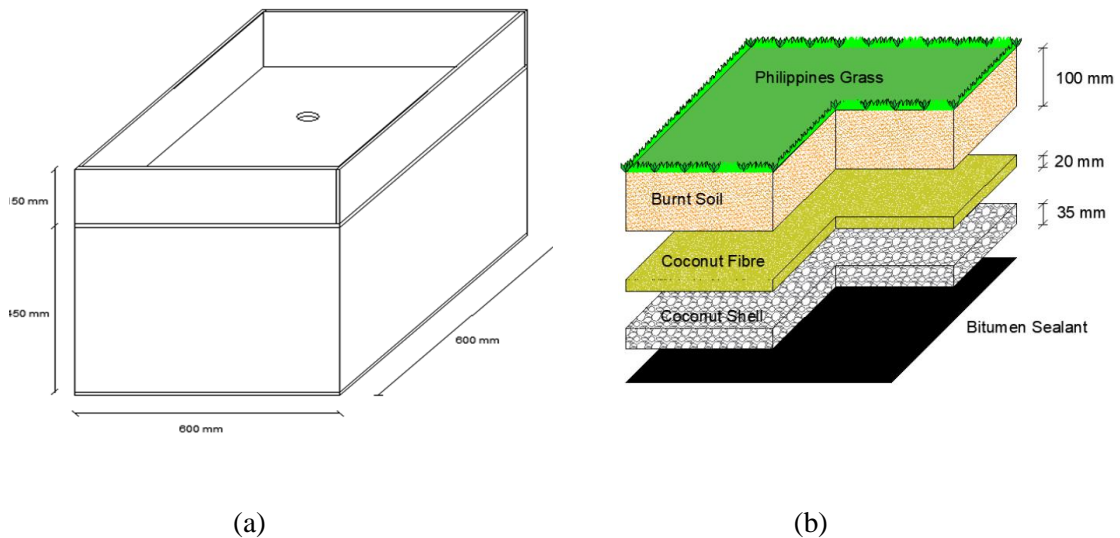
(a) Green roof prototype model and (b) the arrangement of green roof material
